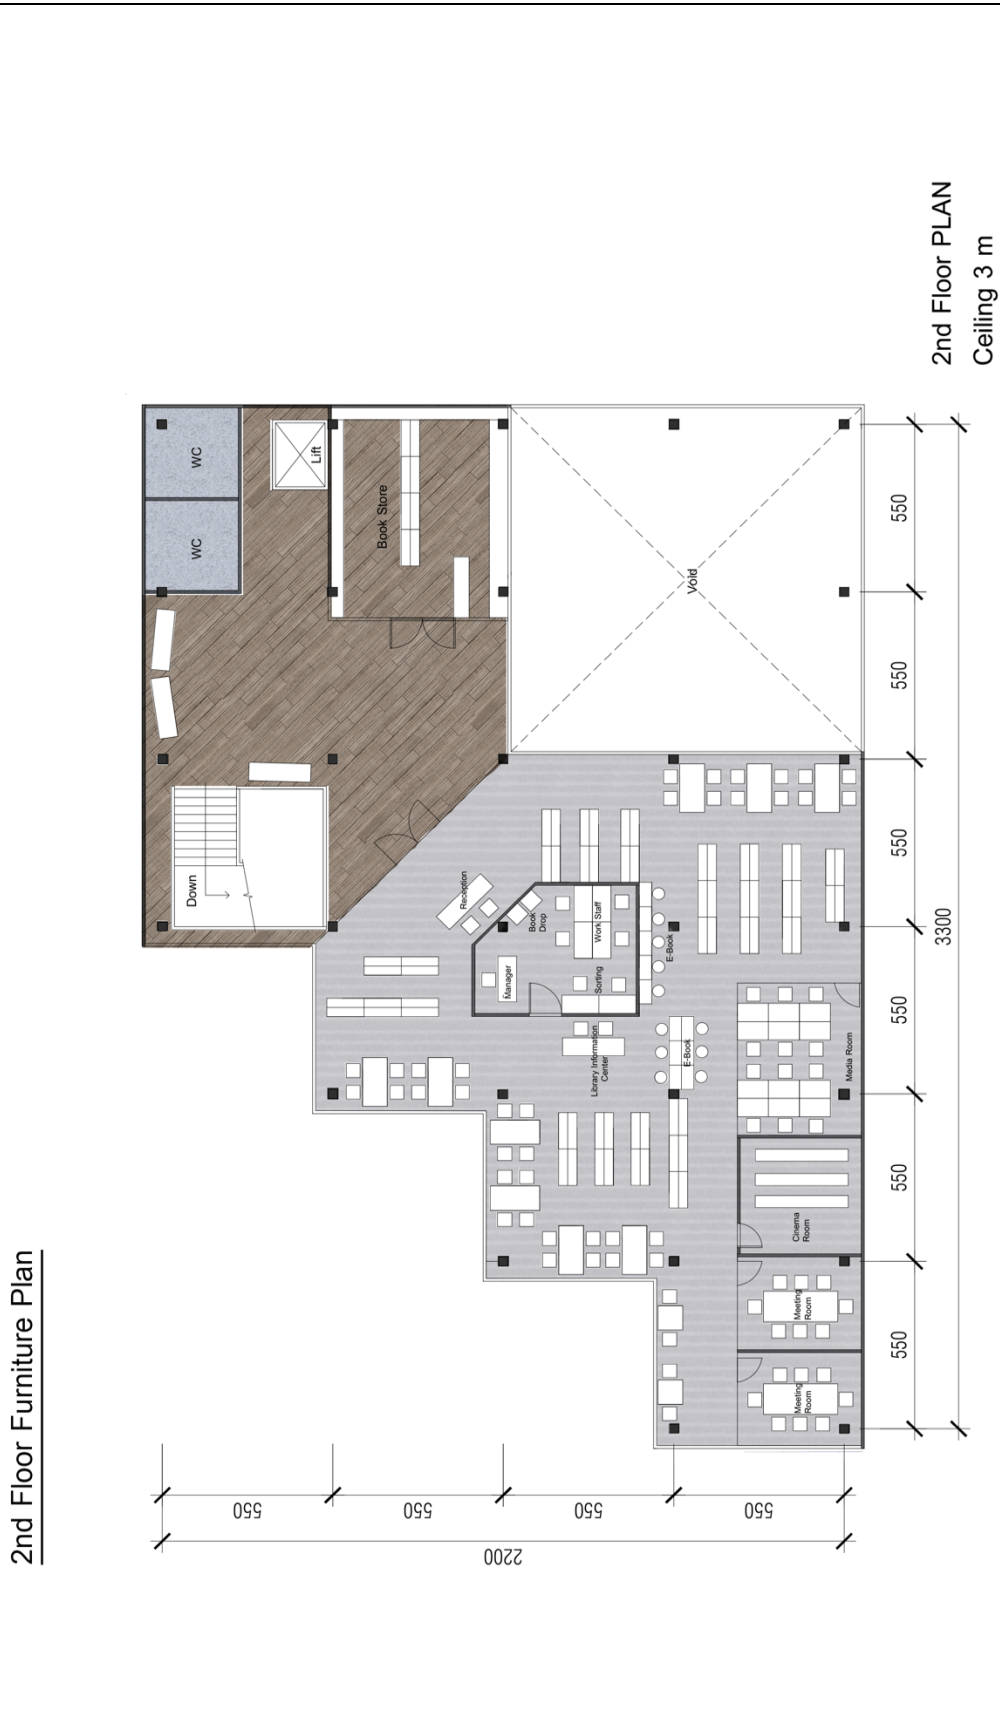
Storytelling to Reflection : Sample of Floor plan and zoning
